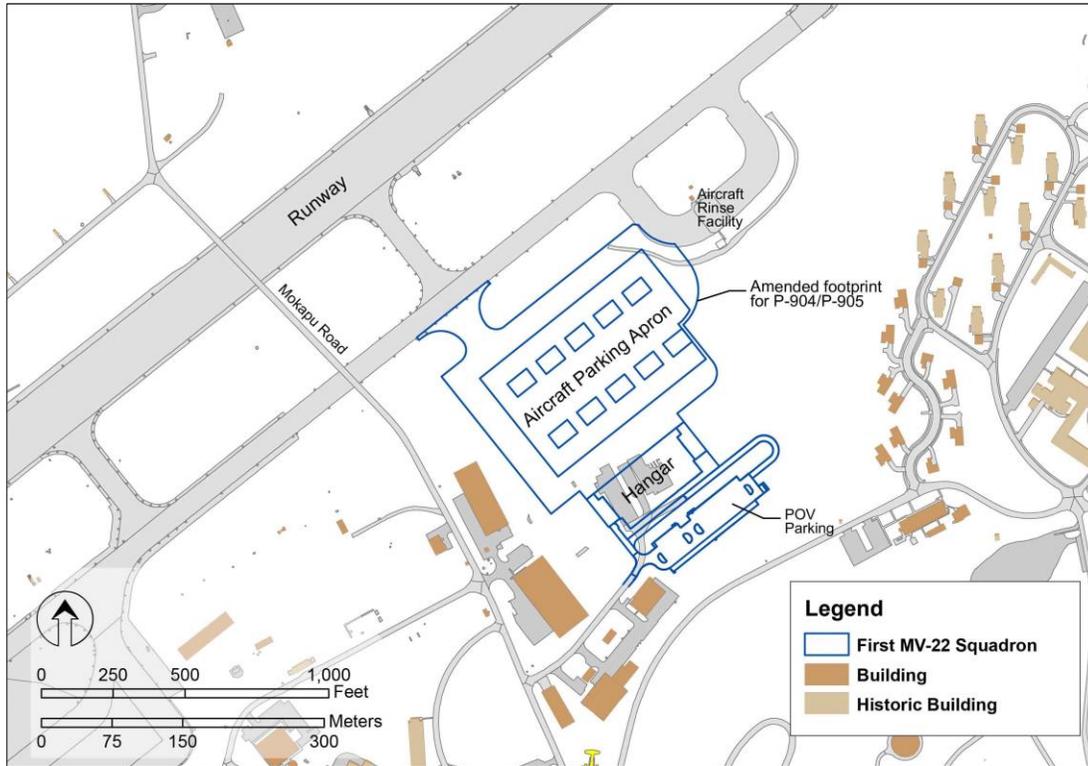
First MV-22 squadron facility site plan (under construction)
